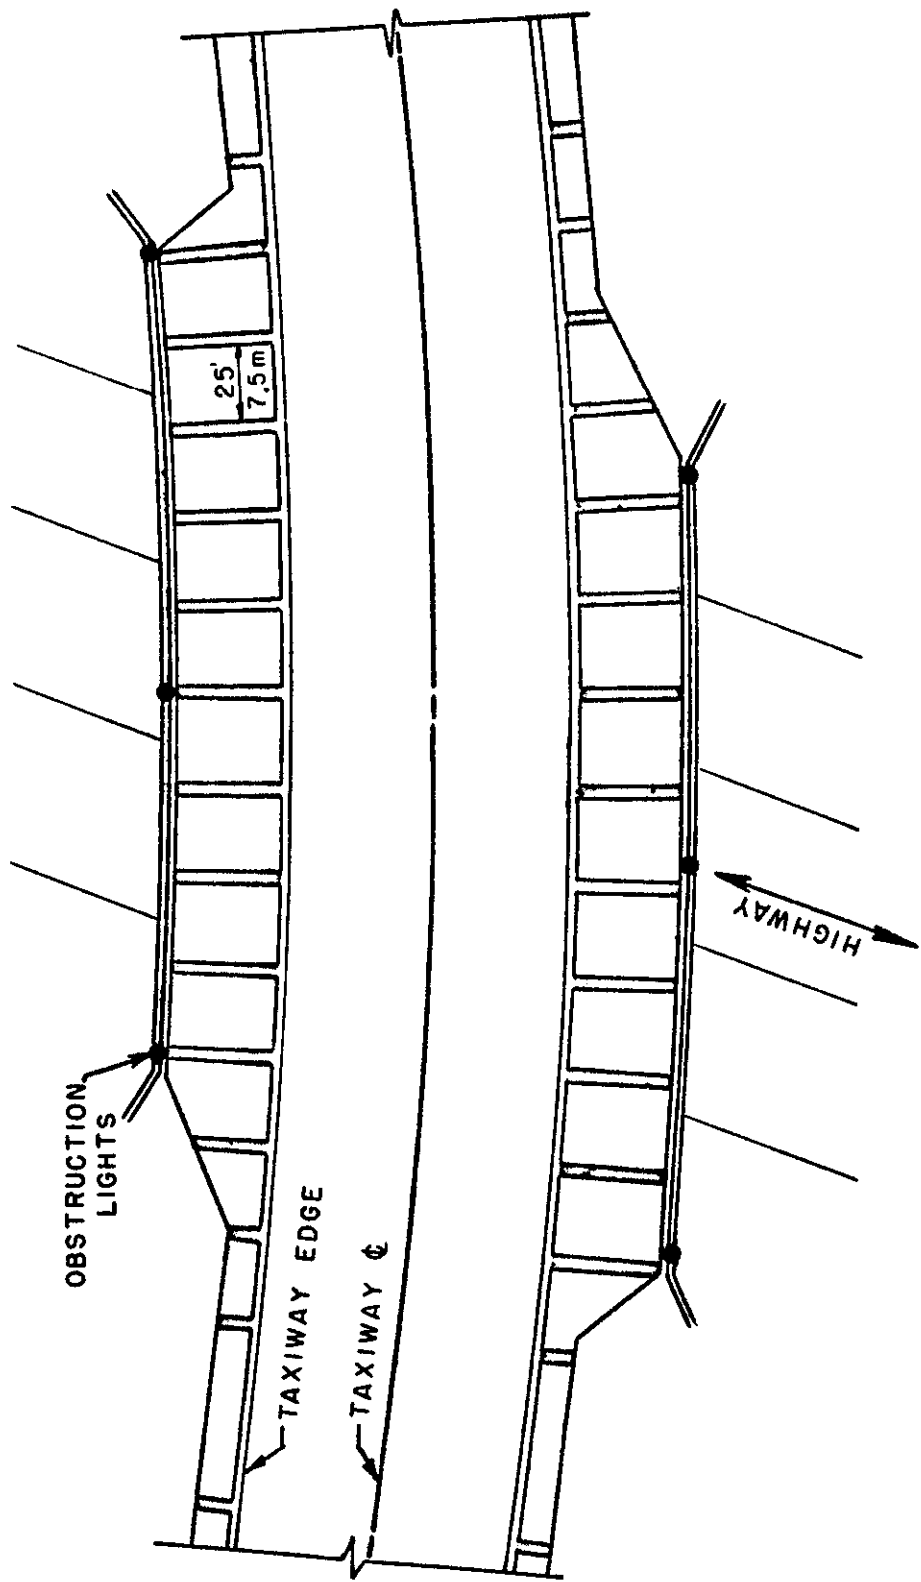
Suggested shoulder marking of minimum width taxiway bridge
